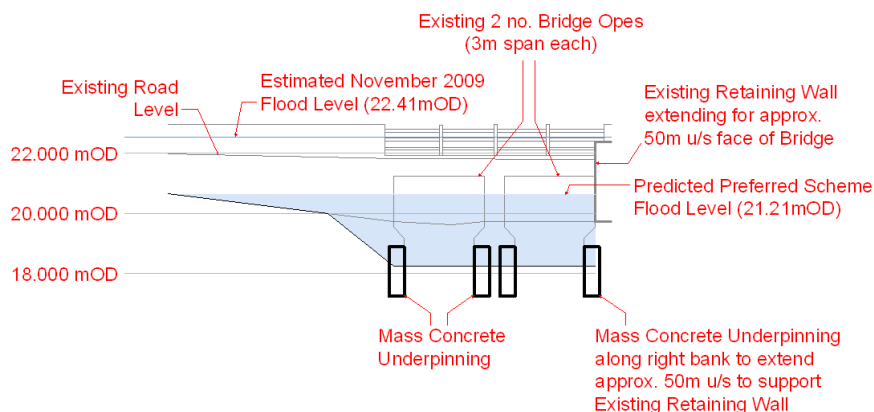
Proposed Works at the R446 Road Bridge in Craughwell
